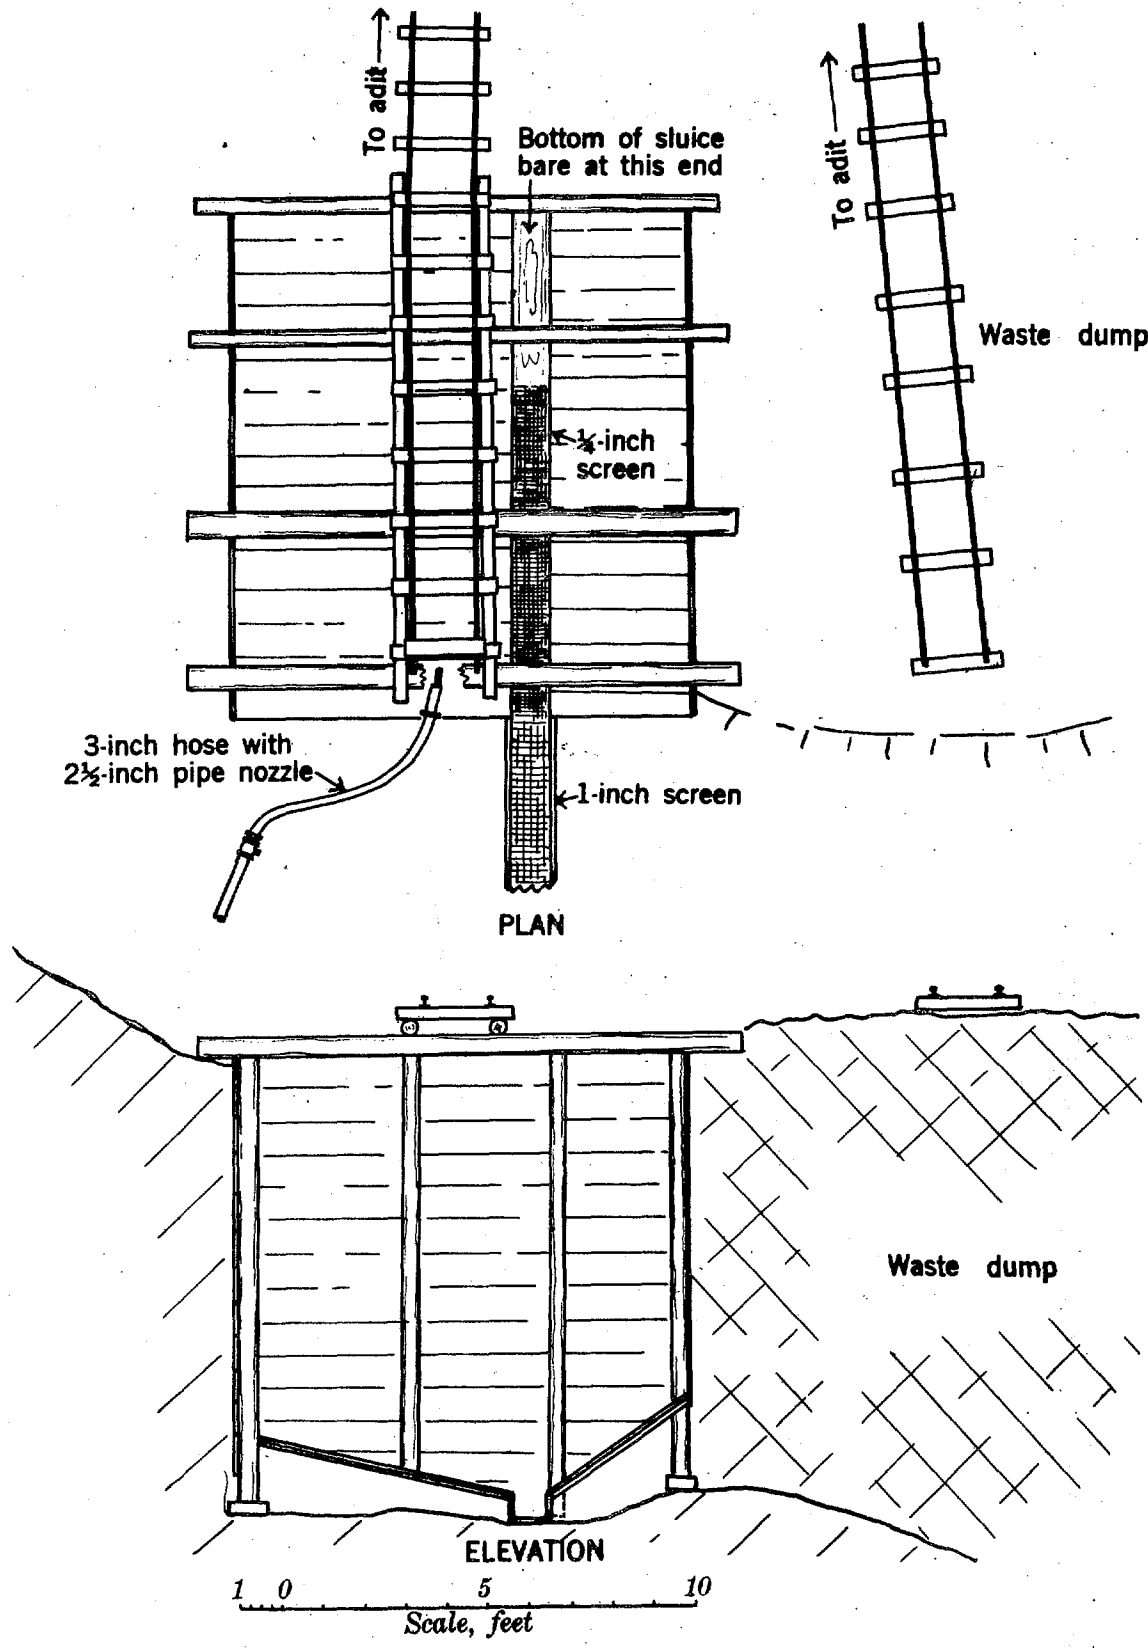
Washing plant, Baker Divide mine, Michigan Bluff, Calif.
